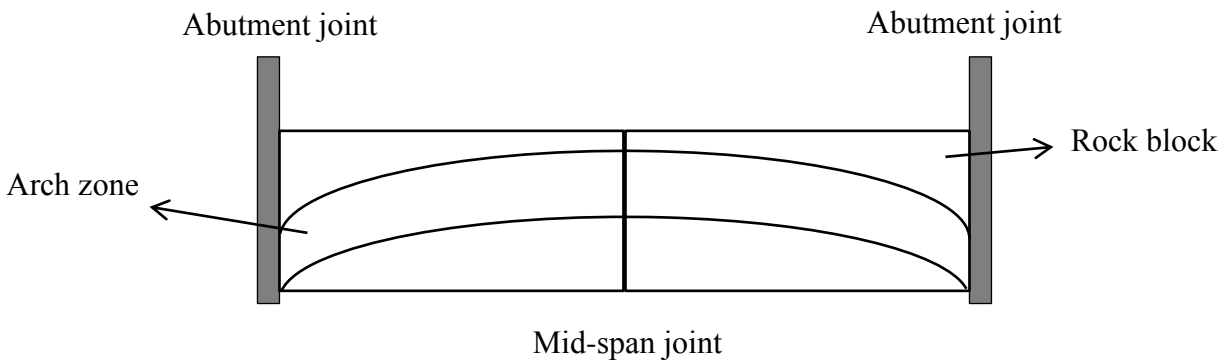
Arching action in bedded and jointed cavern roof (Sterling & Nelson, 1978)
